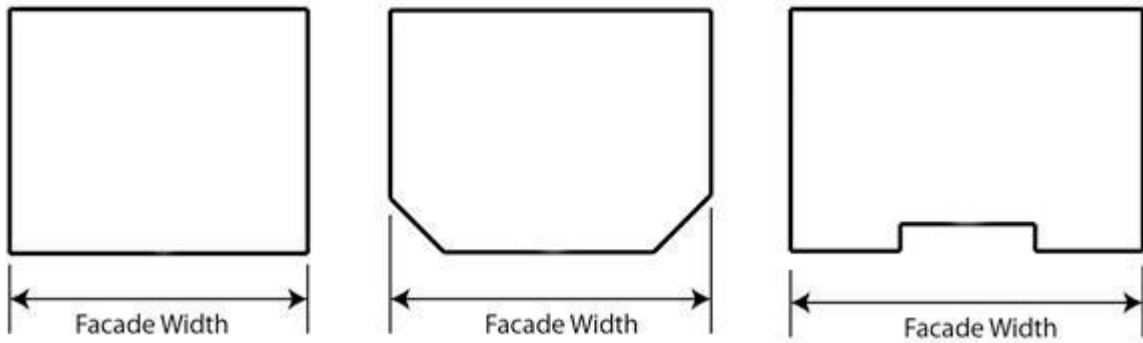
H: Illustration of facade width measurement on varied facade shapes
